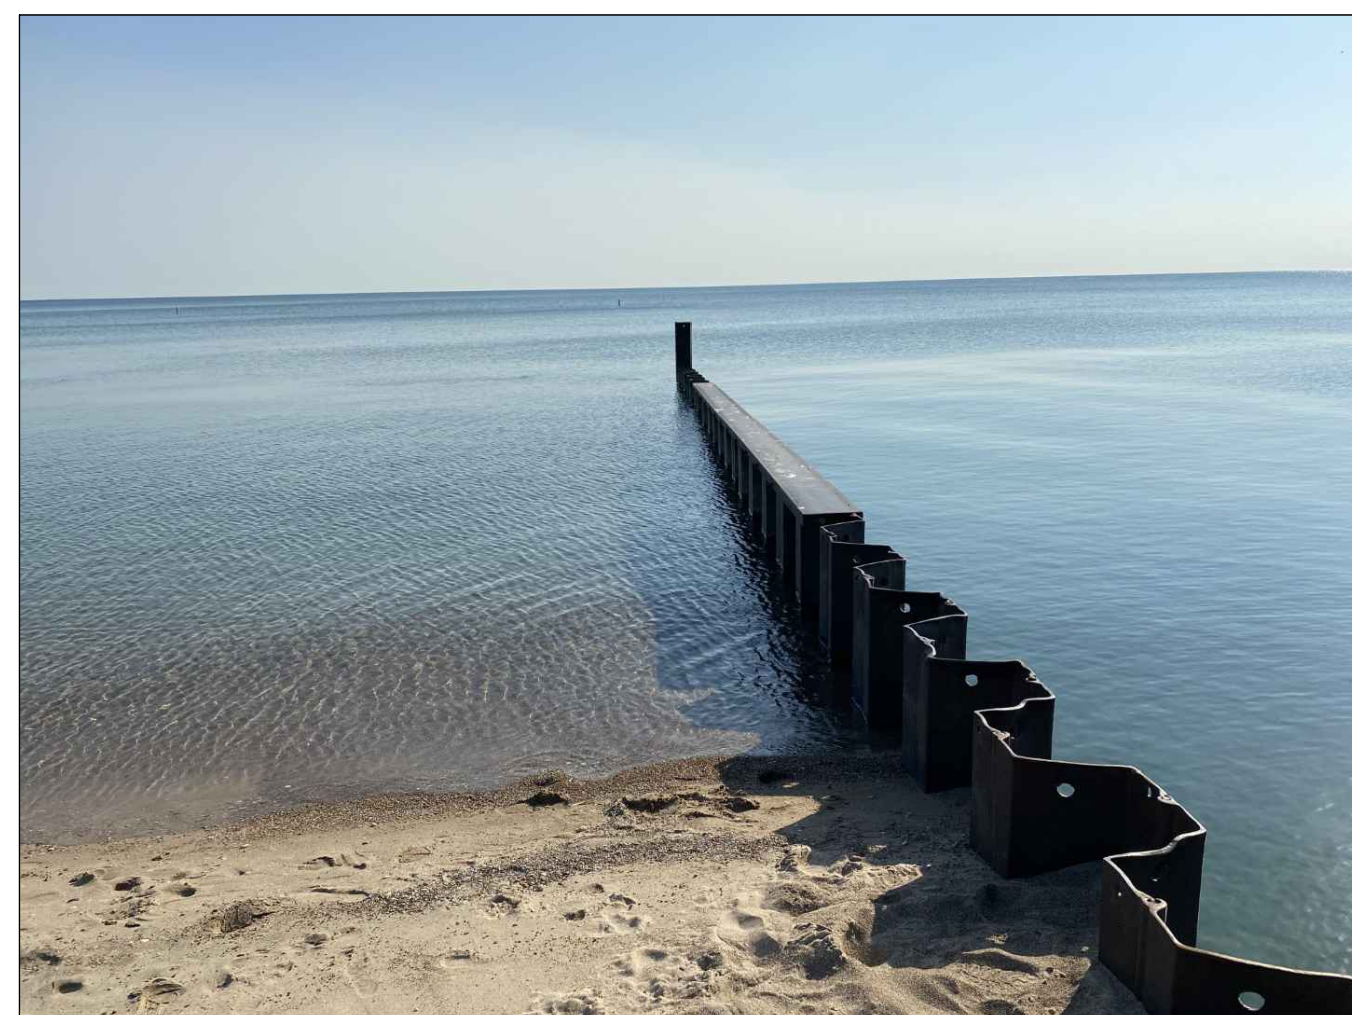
LOOKING EAST AT SOUTH STEEL SHEET PILE GROIN.
